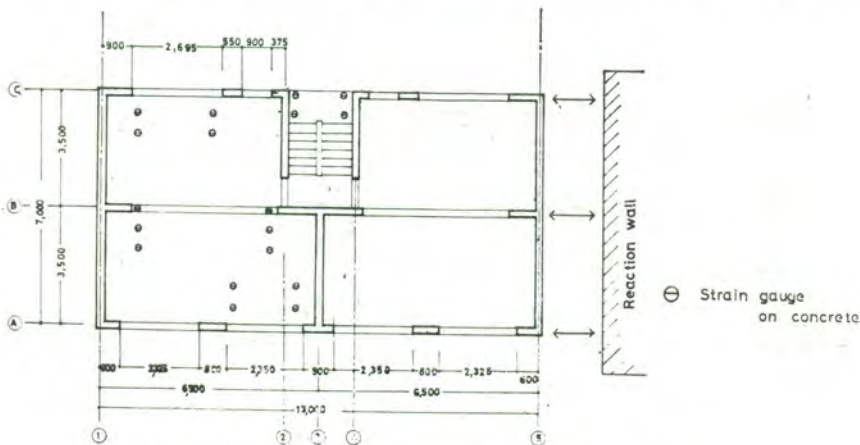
Plan and positions of apparatus (2nd floor)
